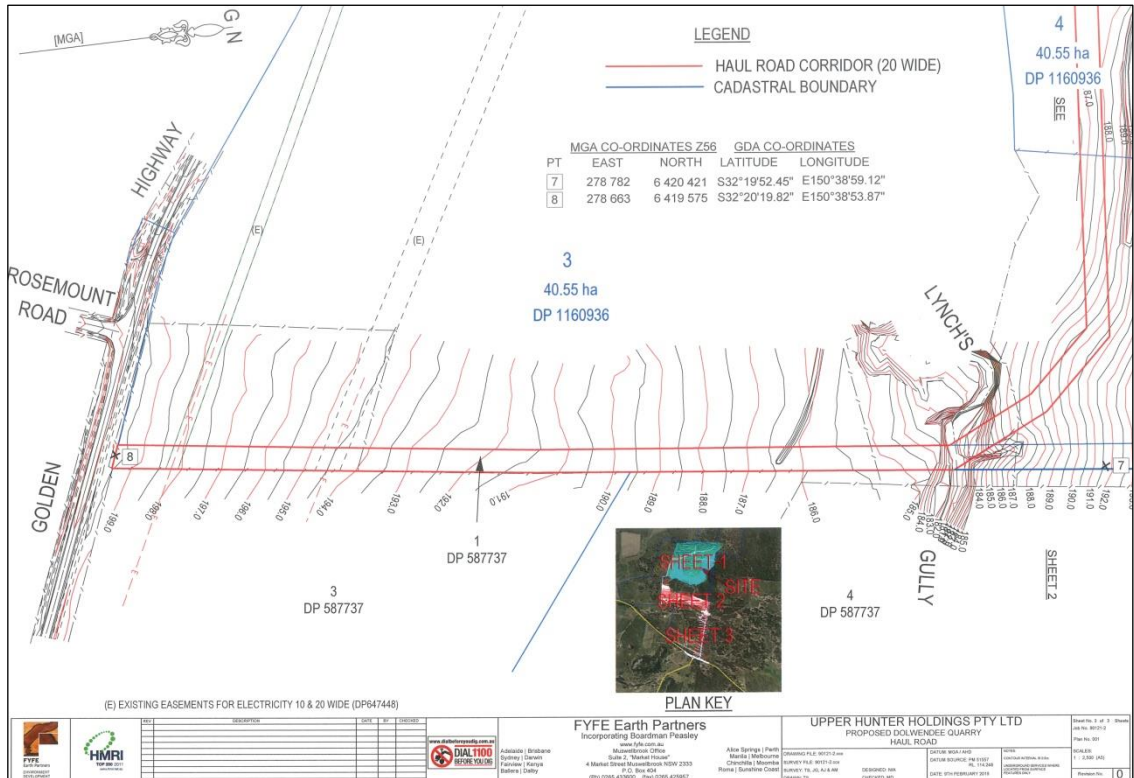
Project Plan (Sheet 3) Golden Highway Intersection
